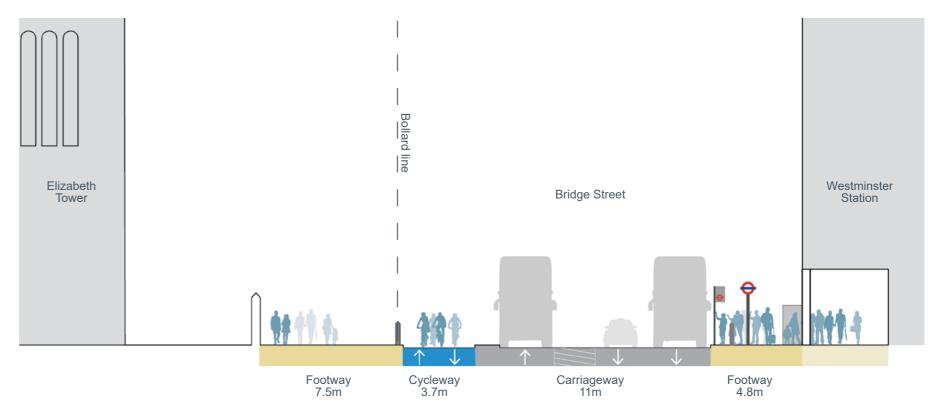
Existing section through Bridge Street taken at the Elizabeth Tower (Big Ben)
